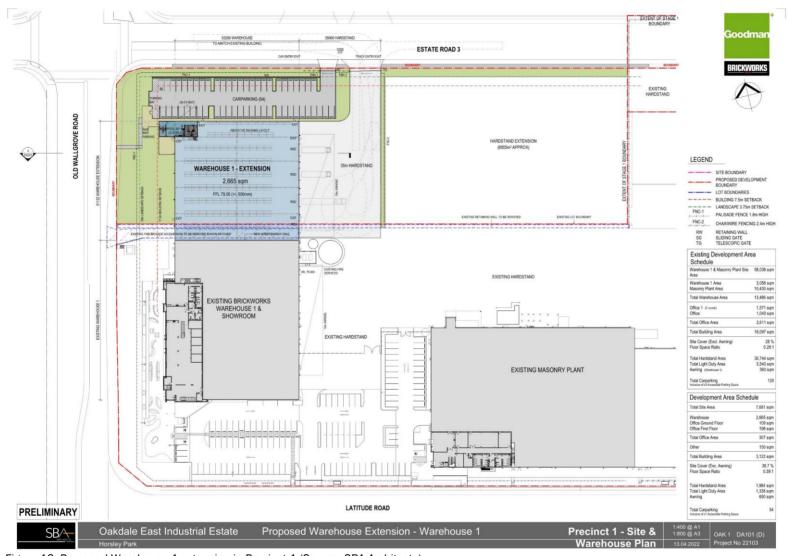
Proposed Warehouse 1 extension in Precinct 1 (Source: SBA Architects)
